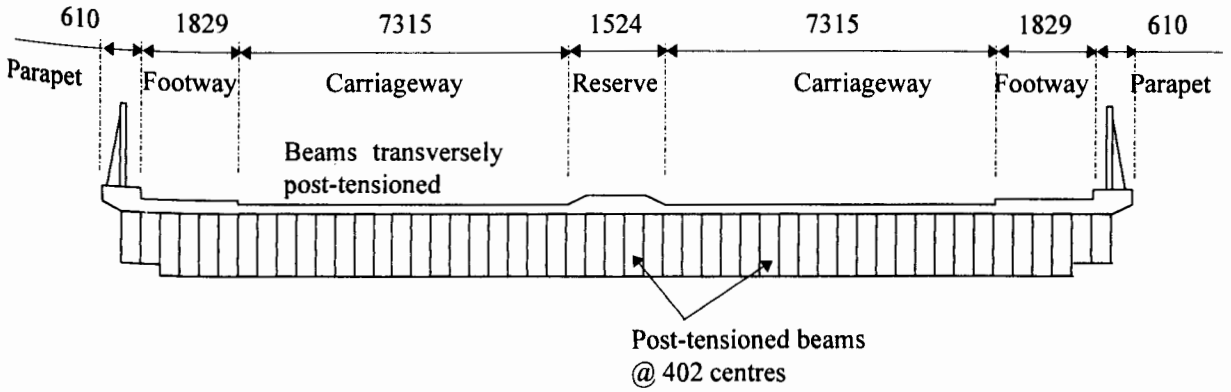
Section through the original deck centre span of the Botley Flyover
